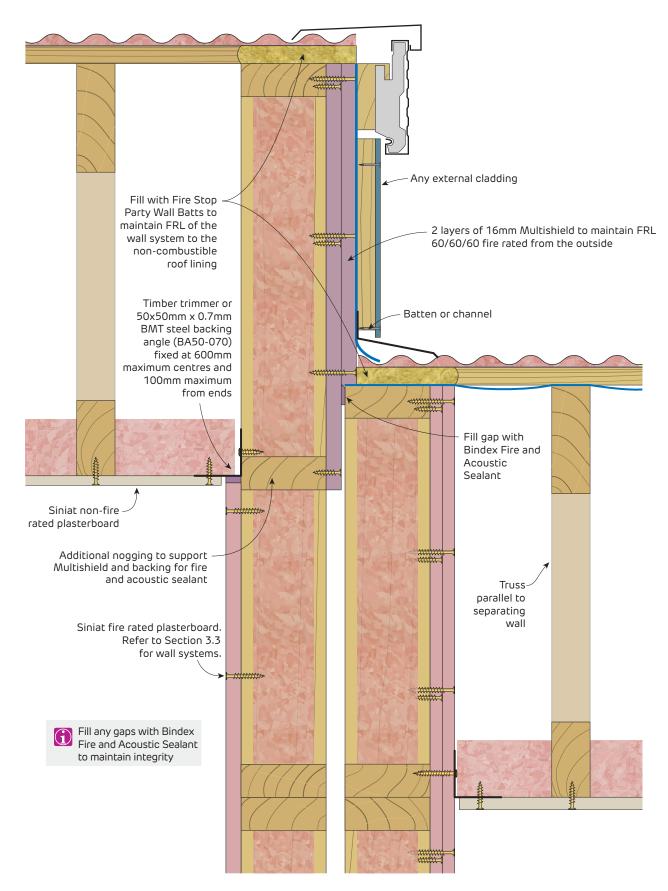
Separating Wall with External Wall Above $\mathsf{FRL}\,60/60/60$
